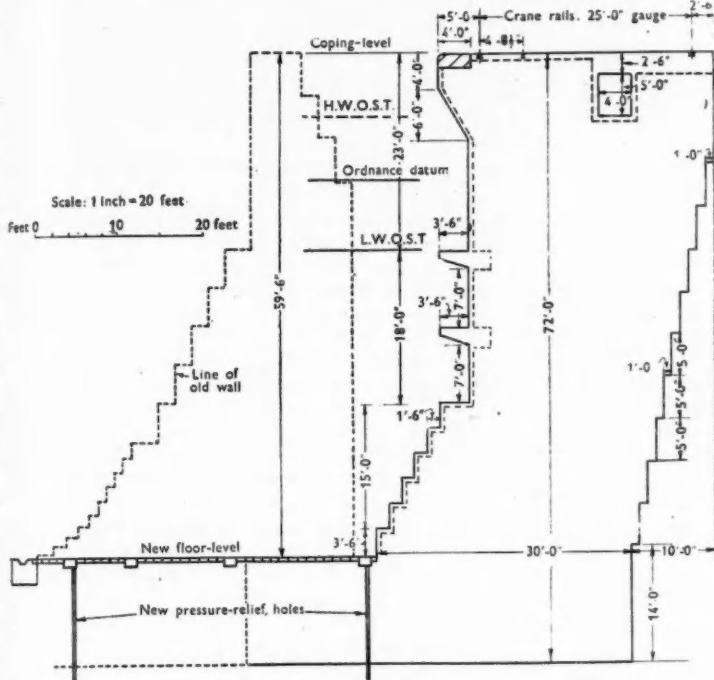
Typical cross-section through New and Old Wall, Devonport.
